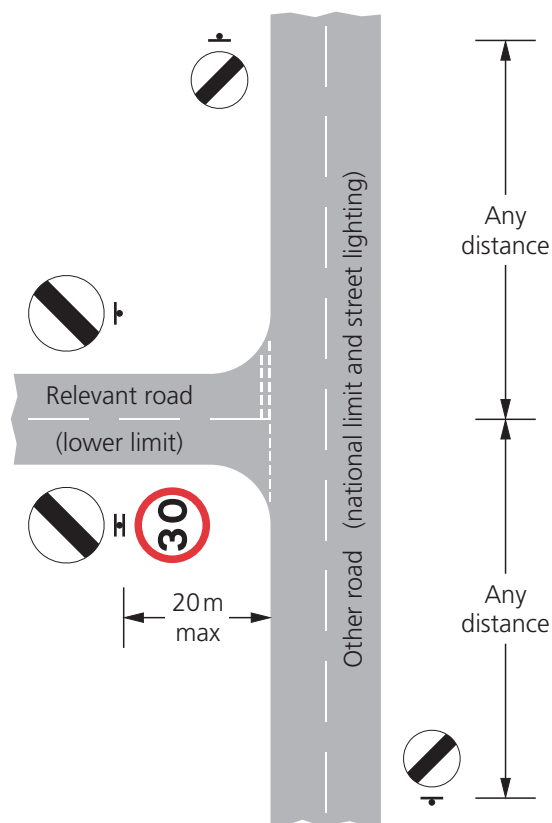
Terminal signs at a road junction where the major road (other road) has a system of street lighting and is subject to the national speed limit
